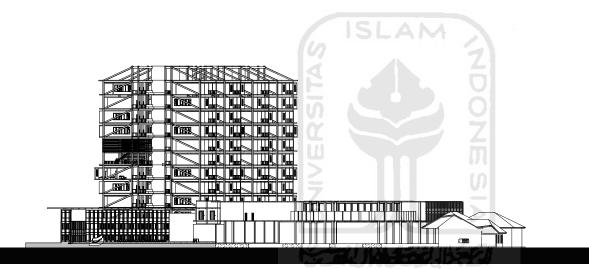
Site section of the mixed use development Source: Author (2021)
